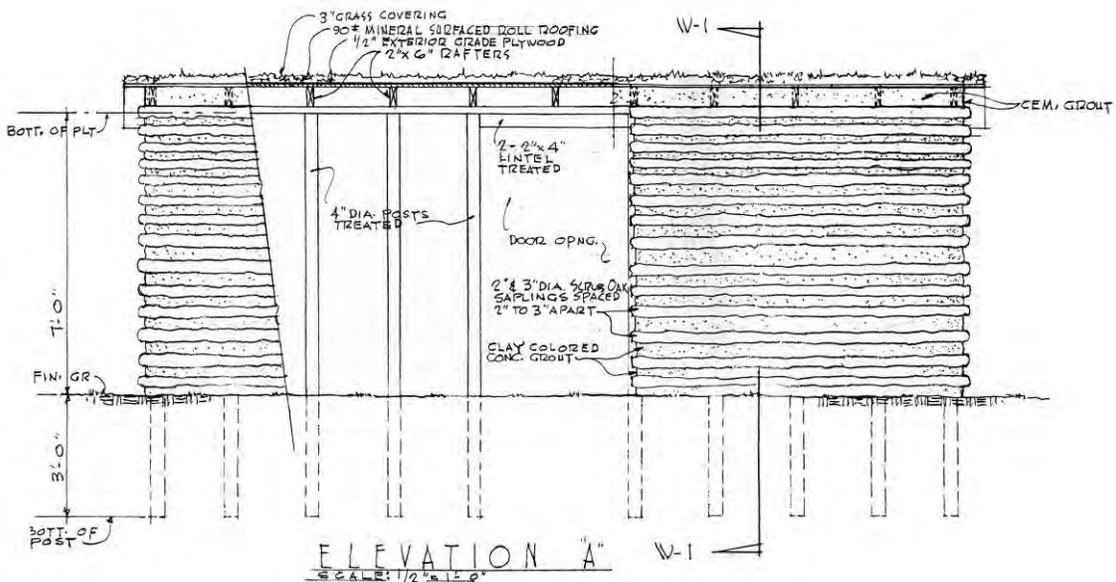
Vietnamese house elevation "A", Camp Gordon, 1966 (standard drawing GOR 28-13-09 sheet 16, Vietnamese and Montagnard houses plans, elevations, and sections, 1 April 1966).
